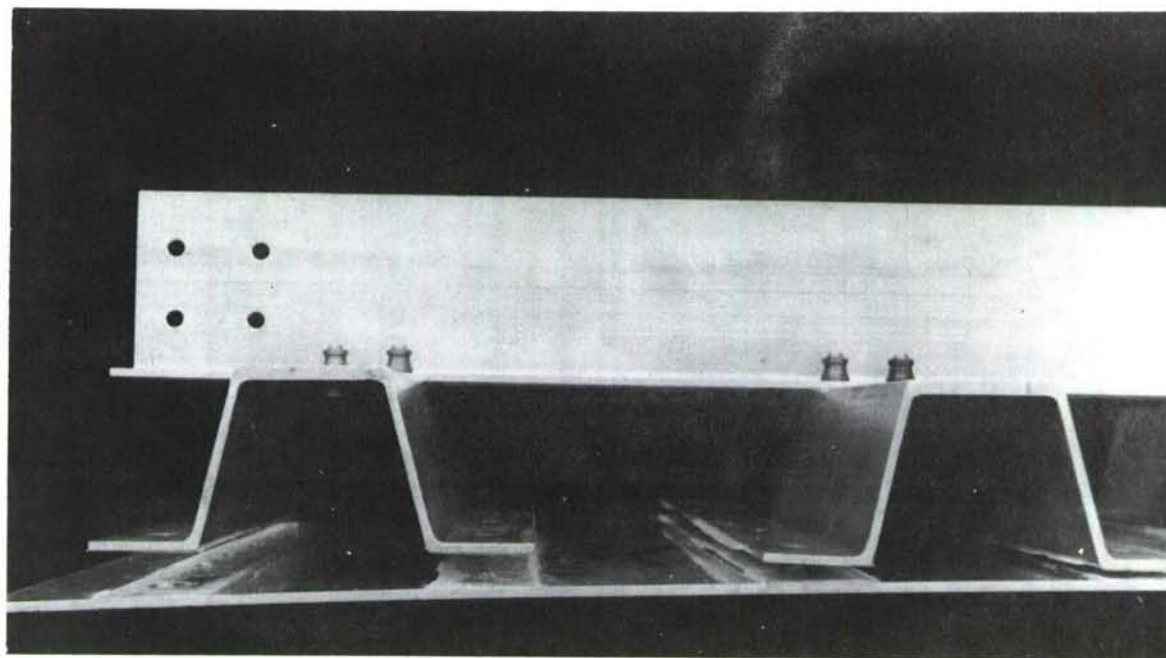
FAILURE OF MODIFIED TEST PANEL (WELDBOND
